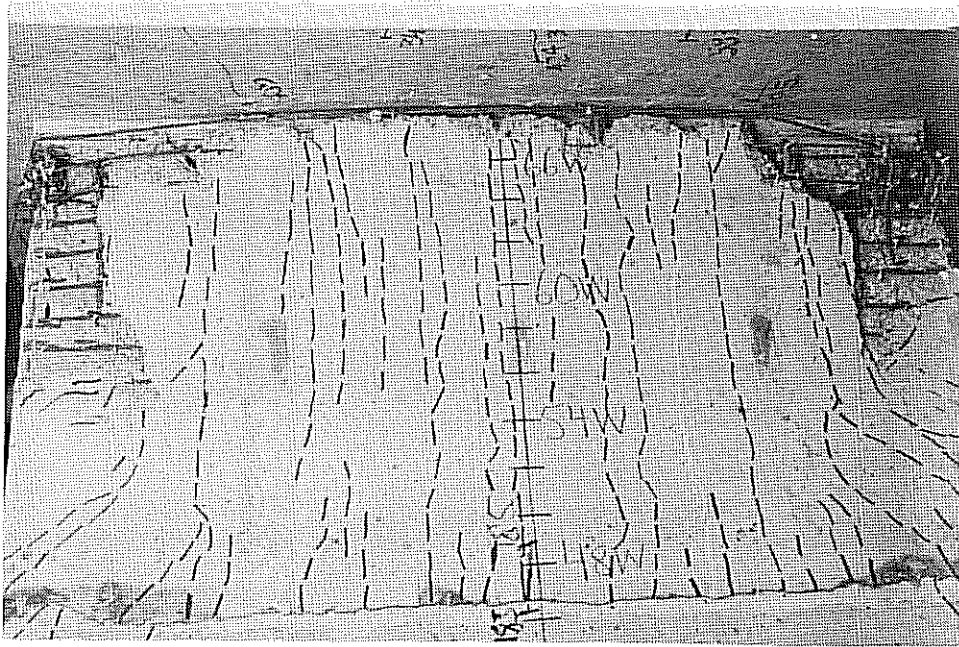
Specimen 9MLP22 Compression Flange Close-Up
